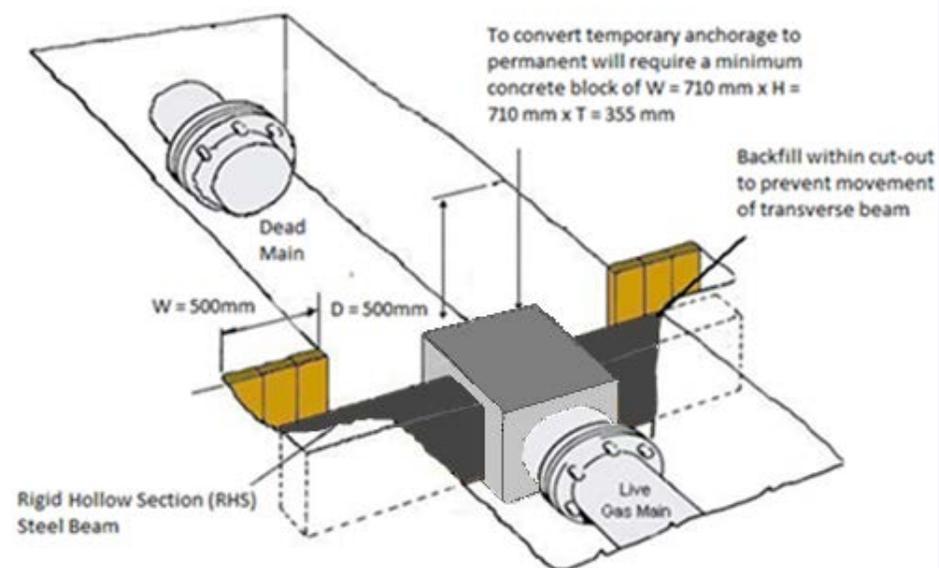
Temporary Anchorage to Permanent Anchorage - Model Design 1
